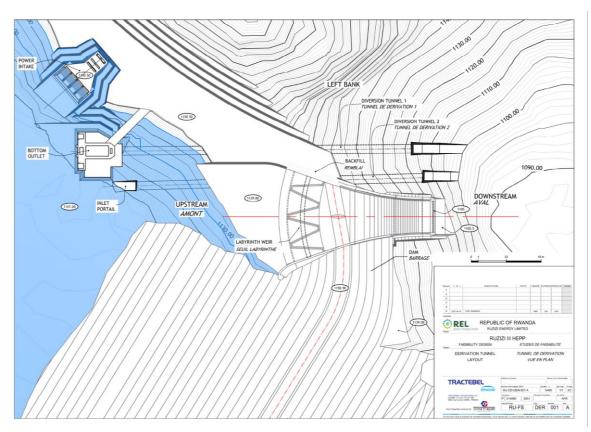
Deviation Tunnel Layout (showing Bottom Outlet, Water Intake and Spillway)
